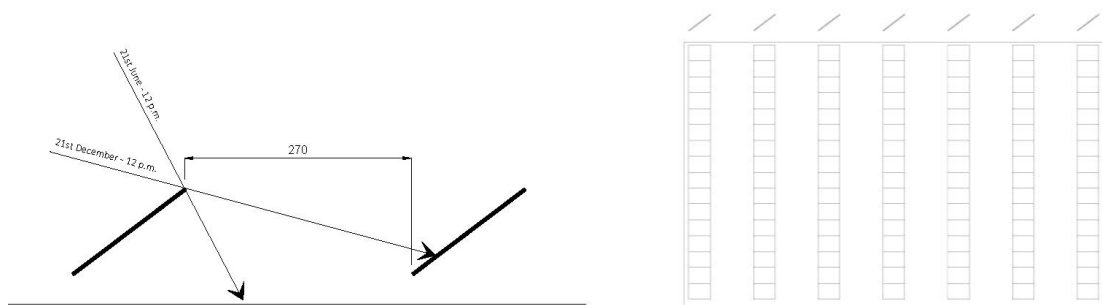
Right: PV panels with 2.70 distance and elevation of sun on the shorter day of the year (21st December, 7°); Left: placement of PVs on roof
